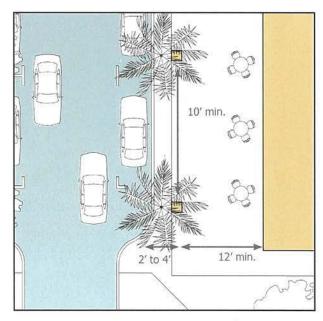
Plan View, Gallery Frontage (Illustrative; balcony roof not shown)
